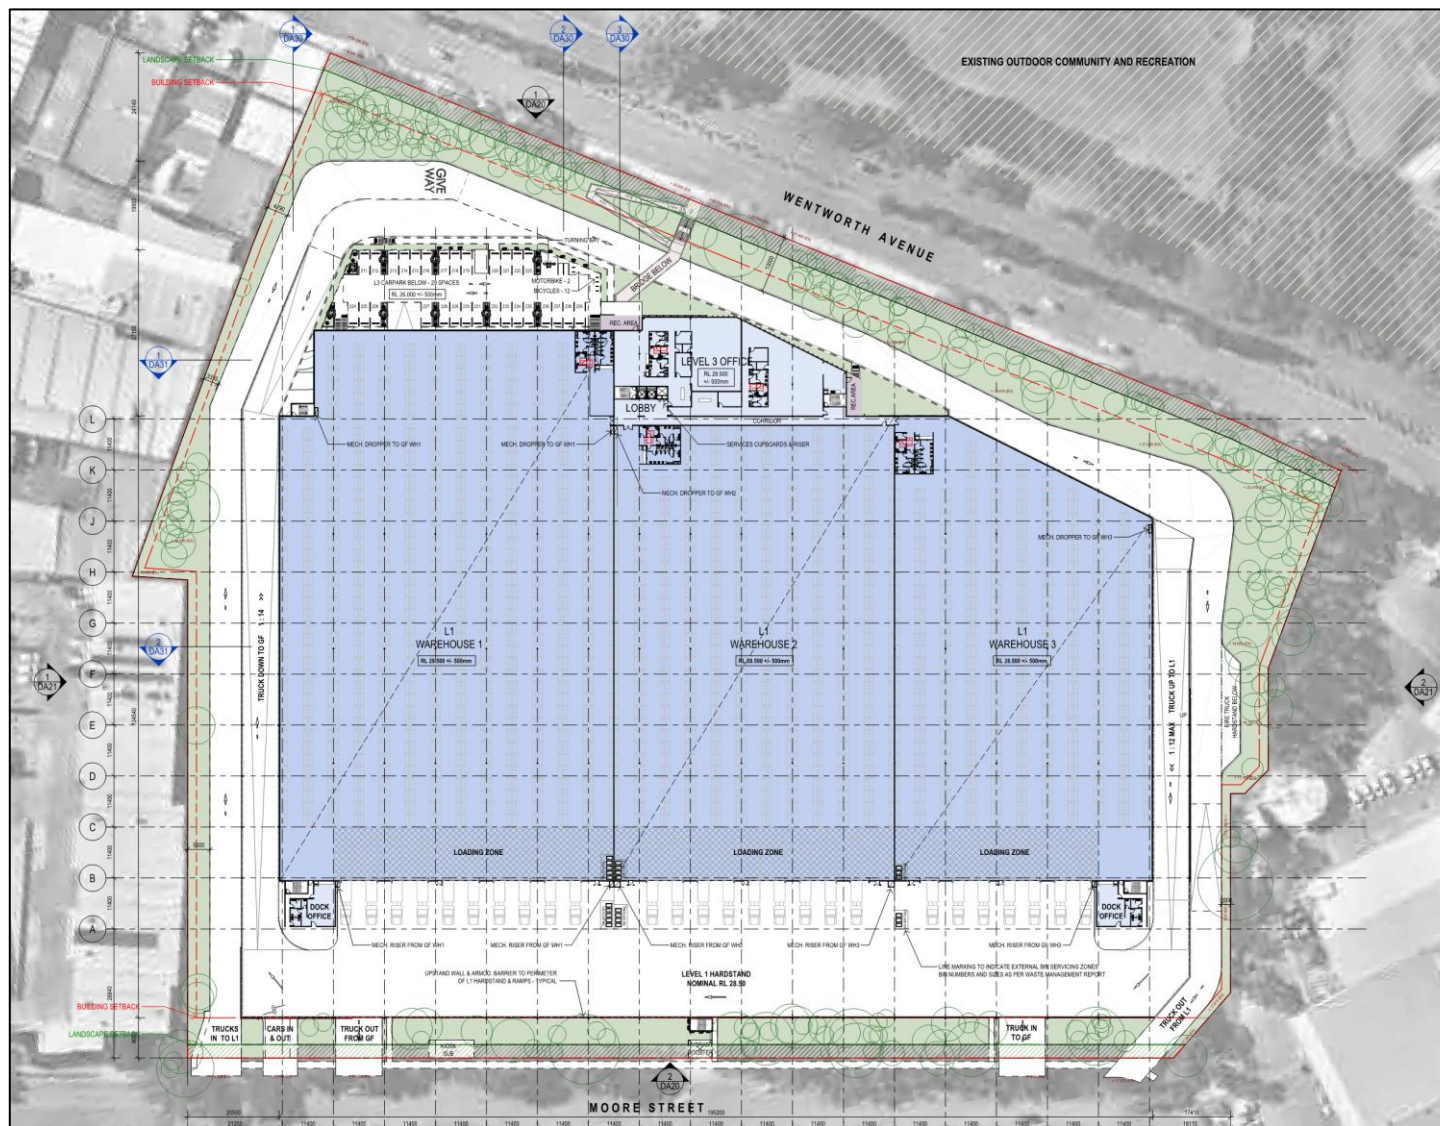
Level 3 Floor Plan (Nettletontribe Architects, 2024)
